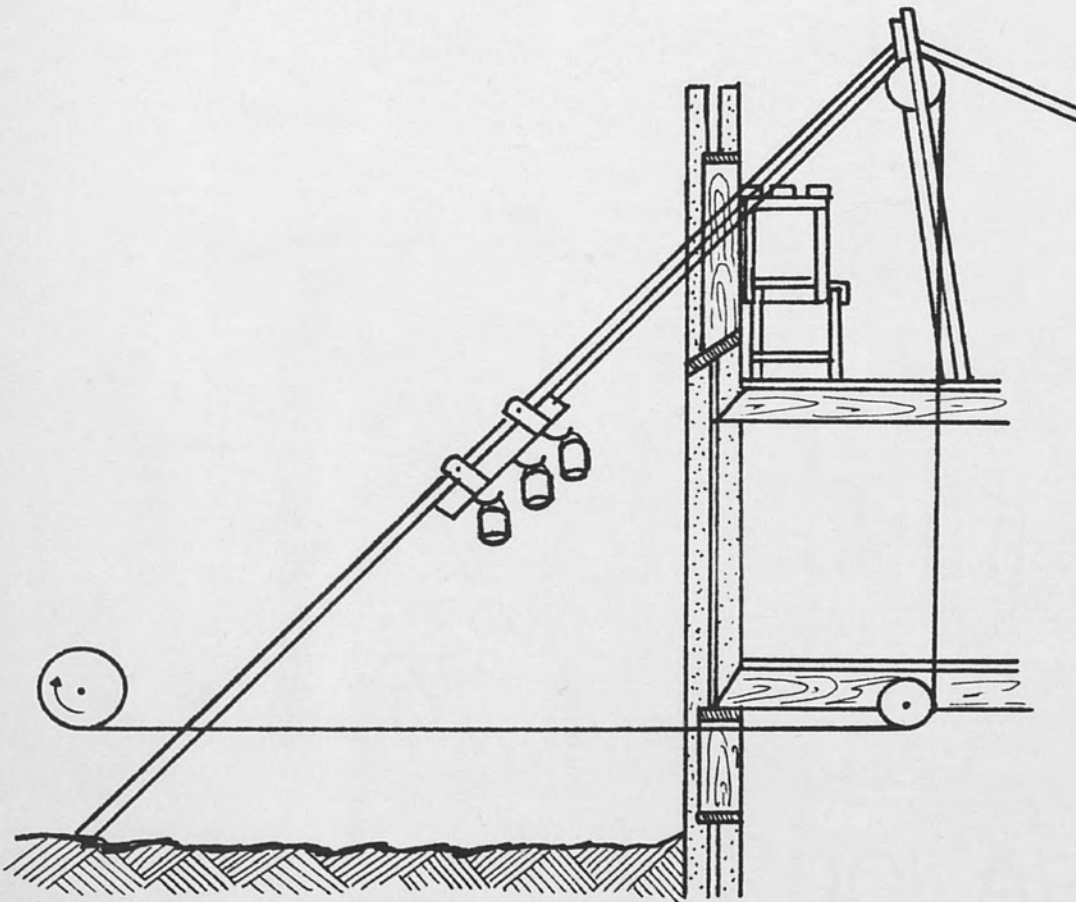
Inclined cableway conveyor for handling pails of concrete. (Redrawn and adapted from Gilbert 1917, p.30)
